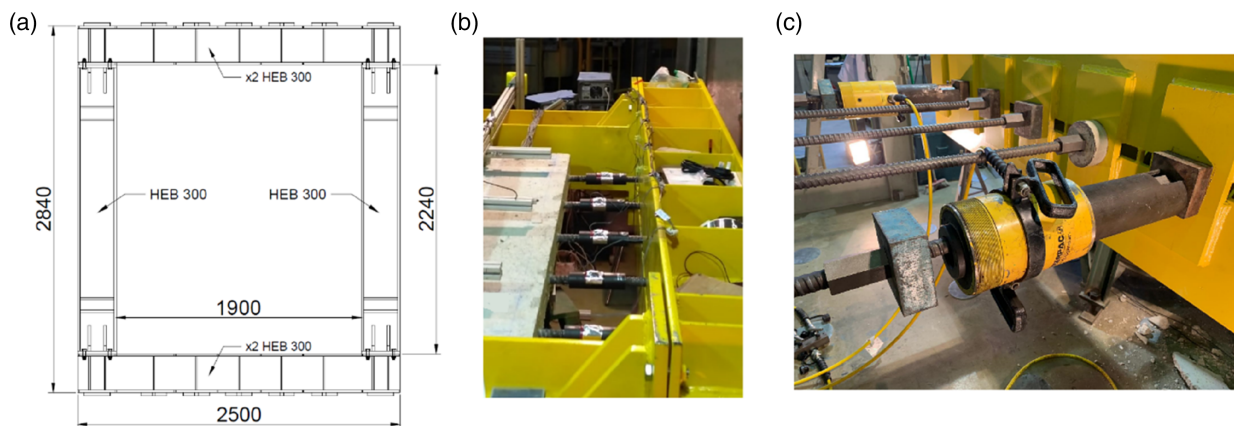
Tensioning system used to apply the axial force to the specimens: (a) steel frame; (b) extension connected to the protruding bars; (c) jacks placed at the active anchorage
